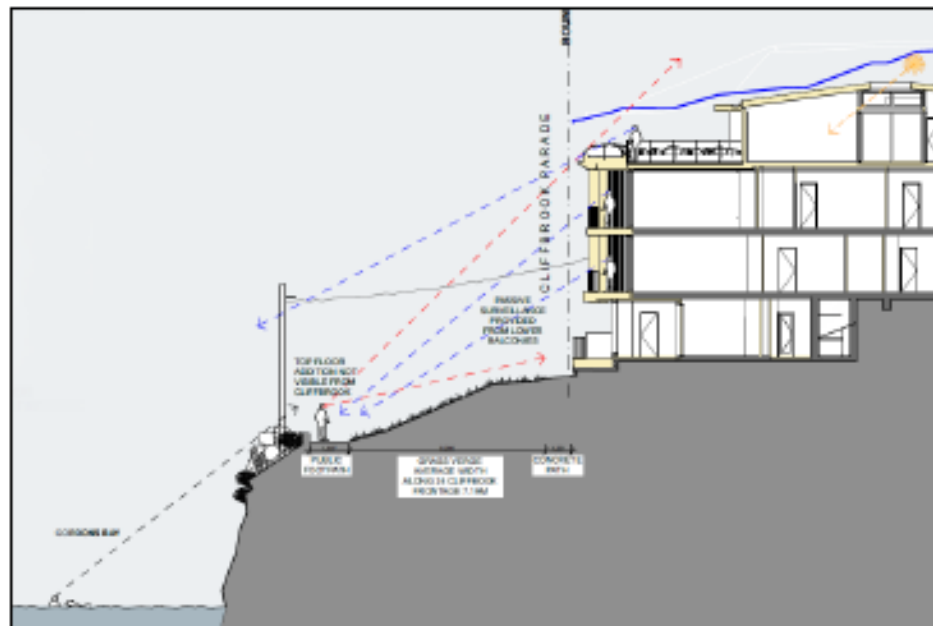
Excerpt Long Section illustrating overlooking mitigation from recessed Unit 4 terrace, provided with landscape planters
